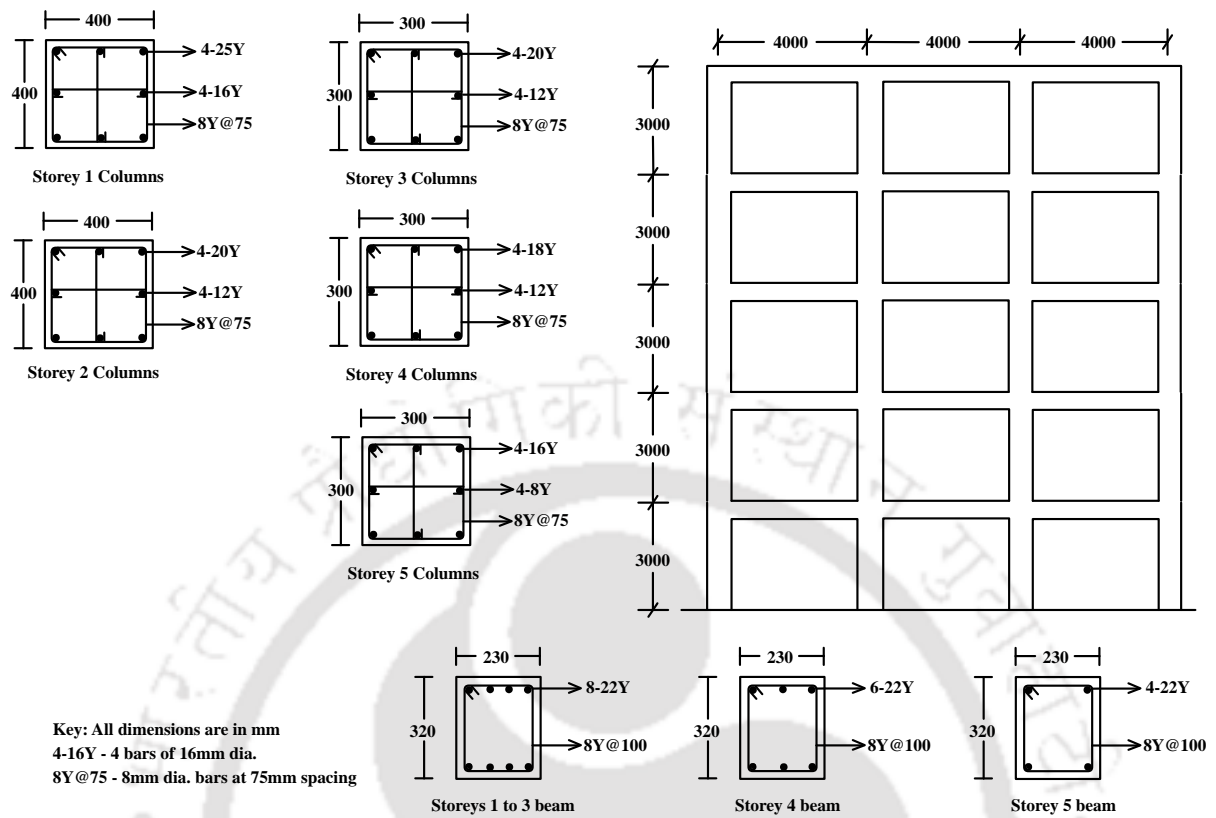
Geometry (not to scale) and sectional details of the 5-storey frame
